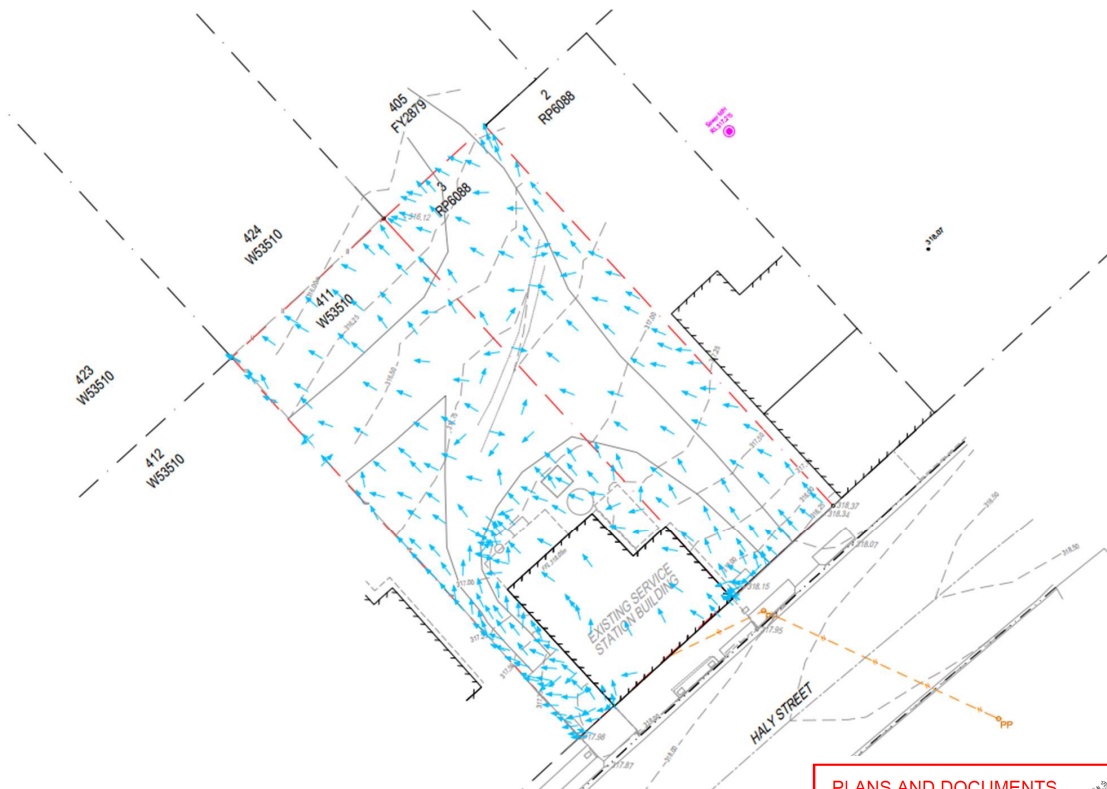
Existing Flows Layout (AutoCAD, Autodesk)
